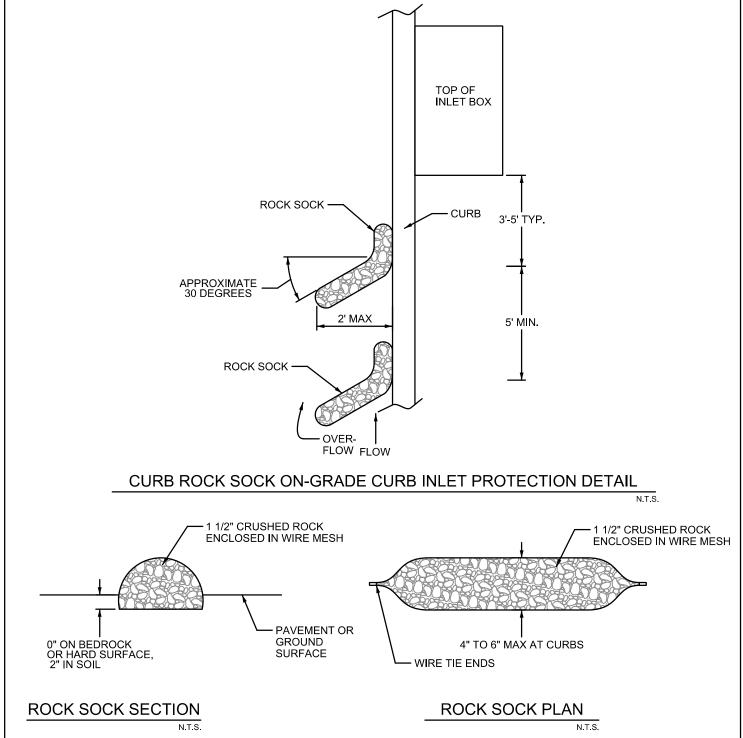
STANDARD CONSTRUCTION DETAIL -CURB ROCK SOCK ON-GRADE CURB INLET PROTECTION (1 OF 2)
